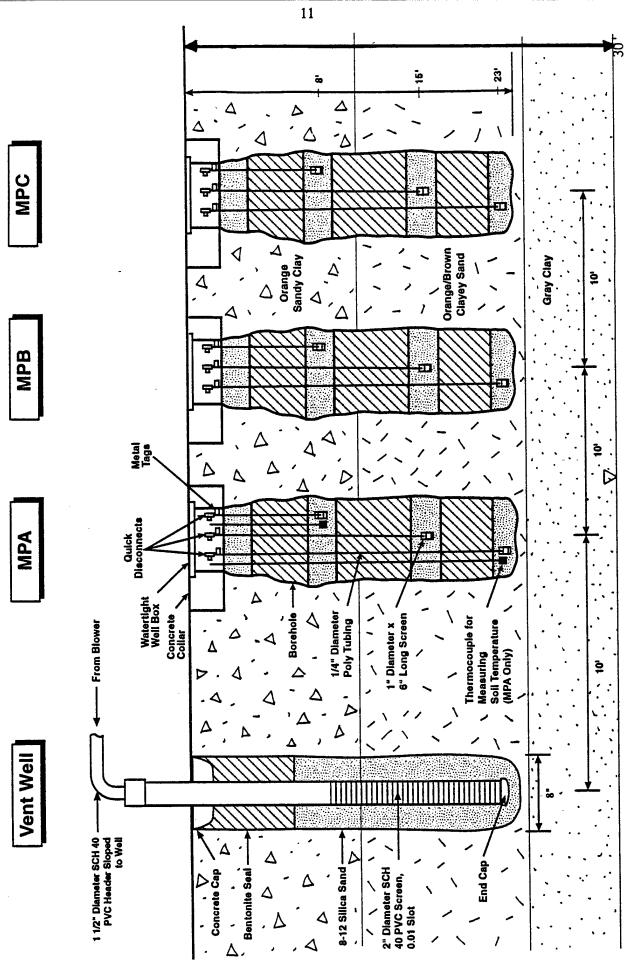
Cross Section of Vent Well and Monitoring Points at Site UST 173 Showing Site Lithology and Construction Detail
